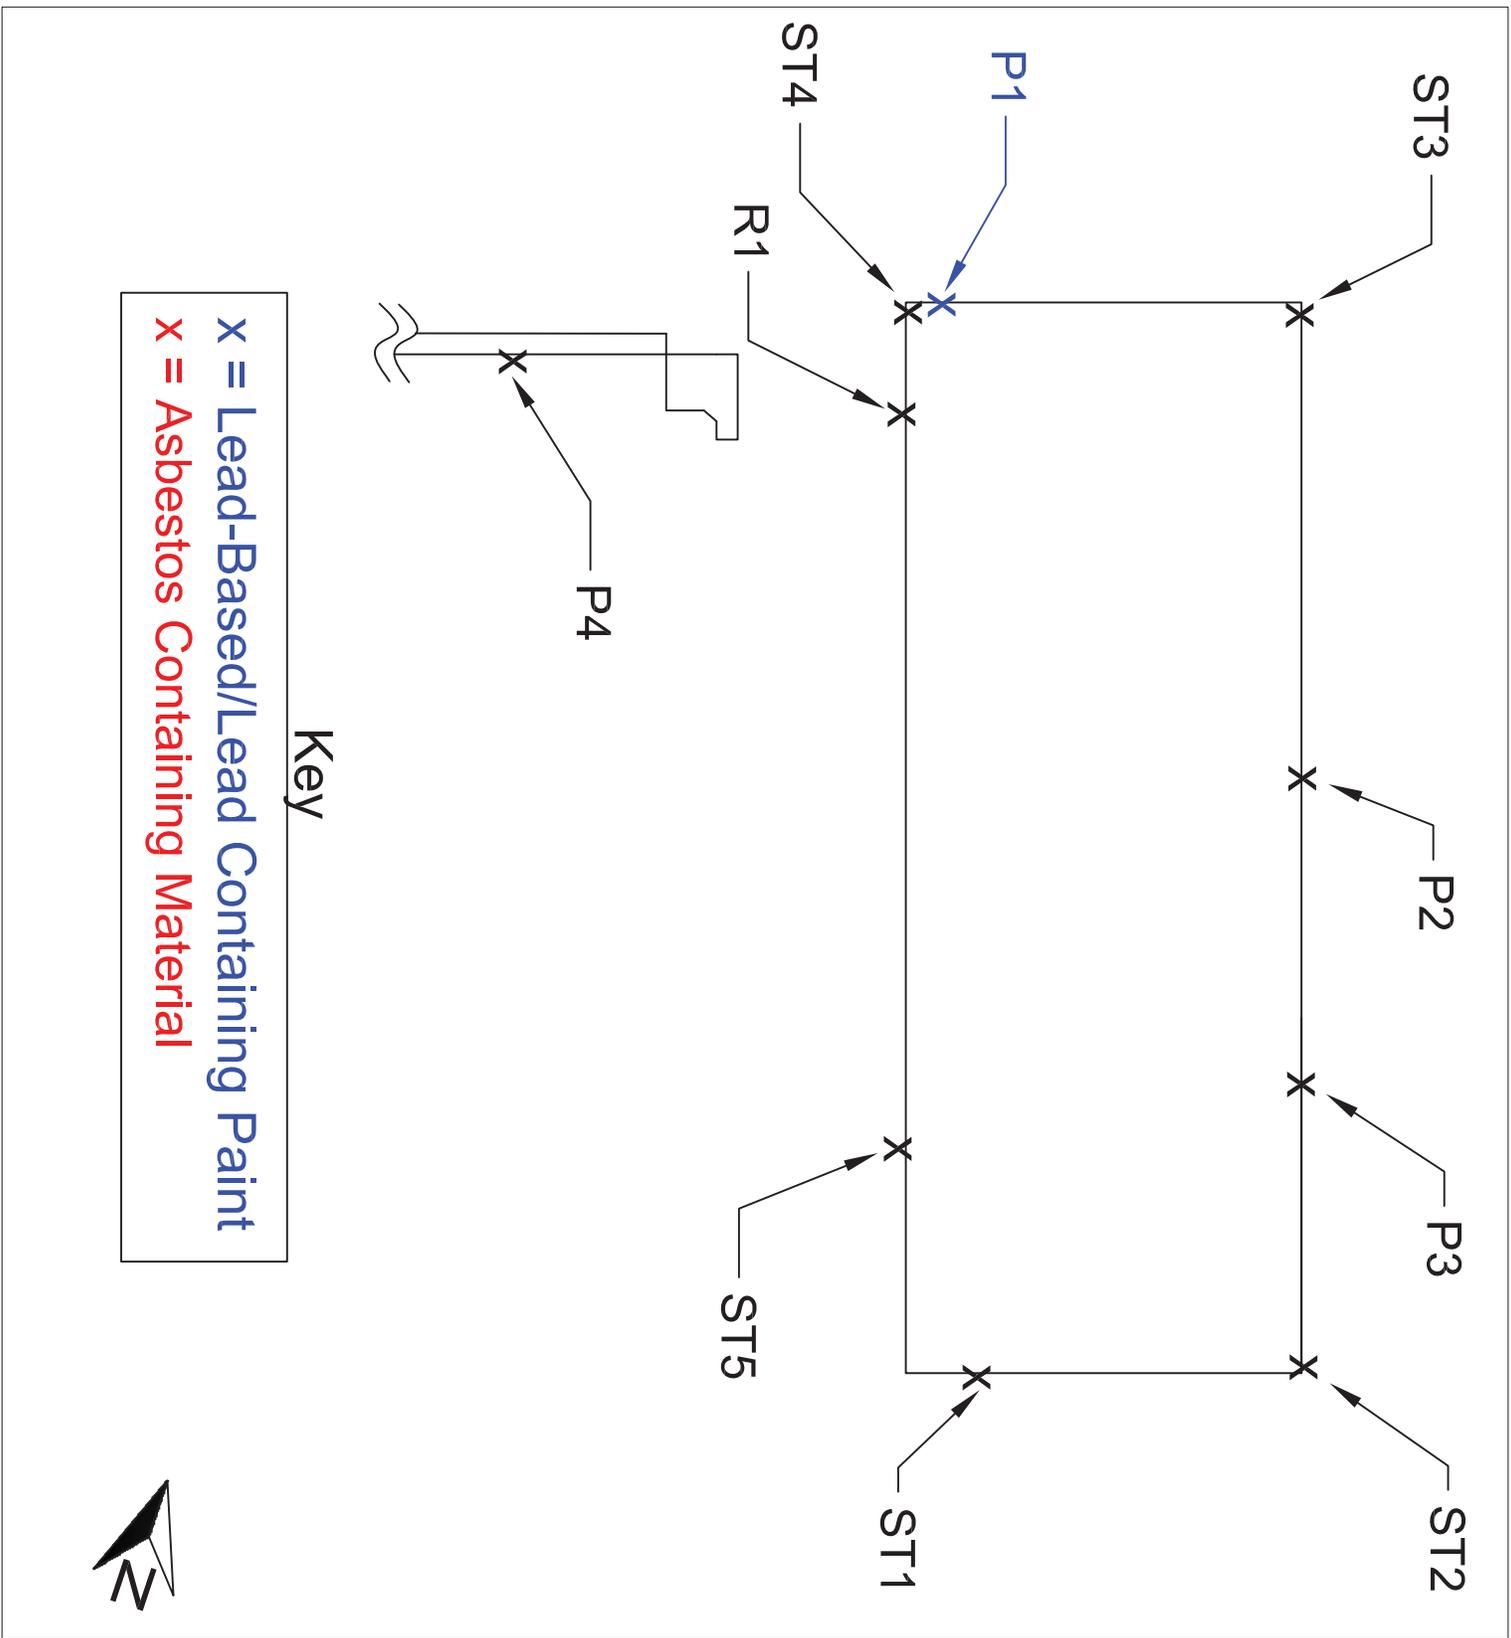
Sample Locations Exterior and Roof Fitness Center - Gym
